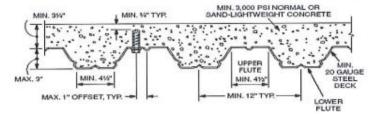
INSTALLATION IN THE SOFFIT OF CONCRETE OVER PROFILE STEEL DECK FLOOR AND ROOF ASSEMBLIES (UPPER FLUTE)
